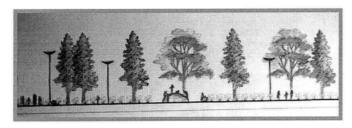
Portion of section/elevation J-J1 showing climbing boulders, nested poles and ornamental plantings in Rivers Play area
